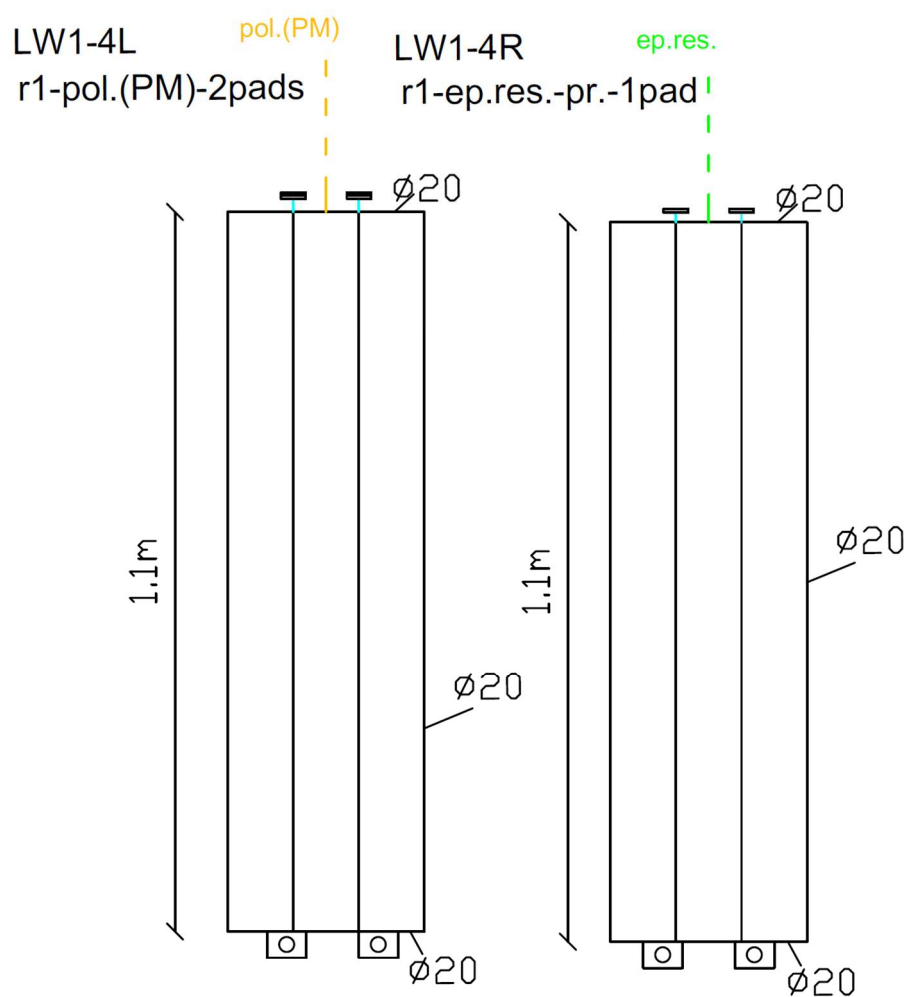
Living wall 1-4 left side and living wall 1-4 right side.
